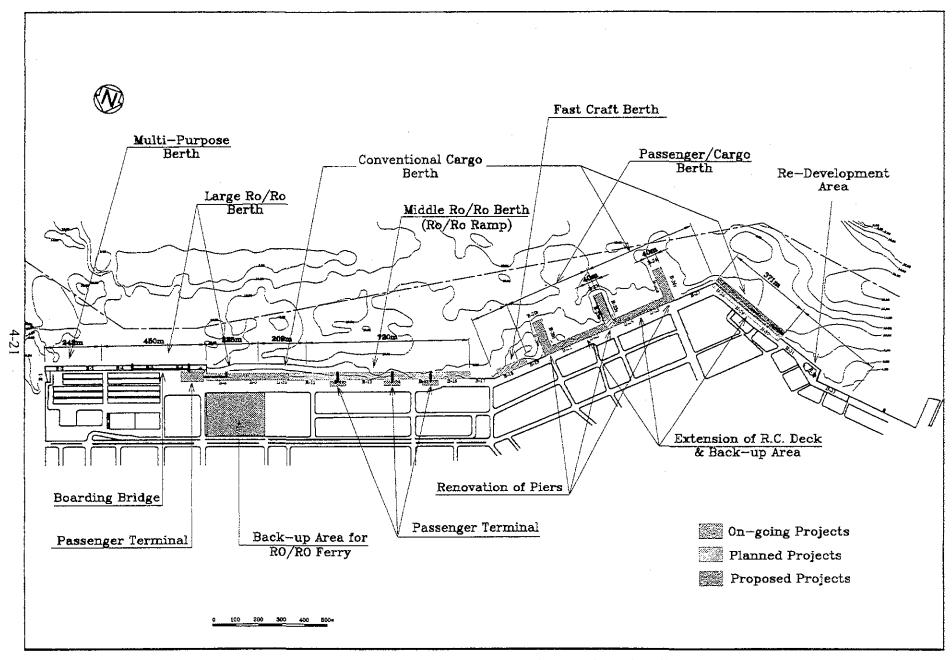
Cebu Baseport Development Plan (2020)
